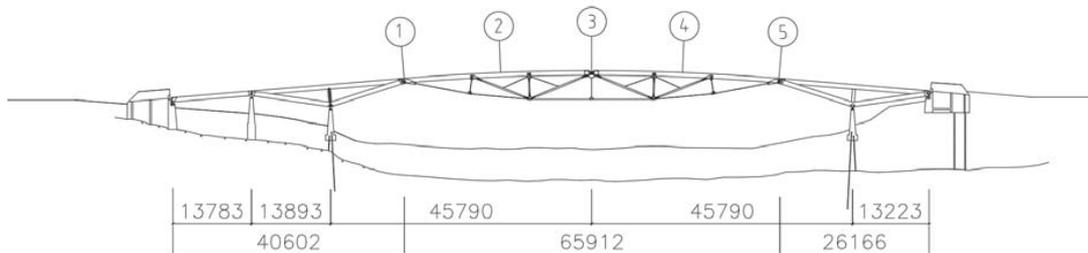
Elevation view: Kjærra Bridge with points of measurements (all dimensions in mm)
